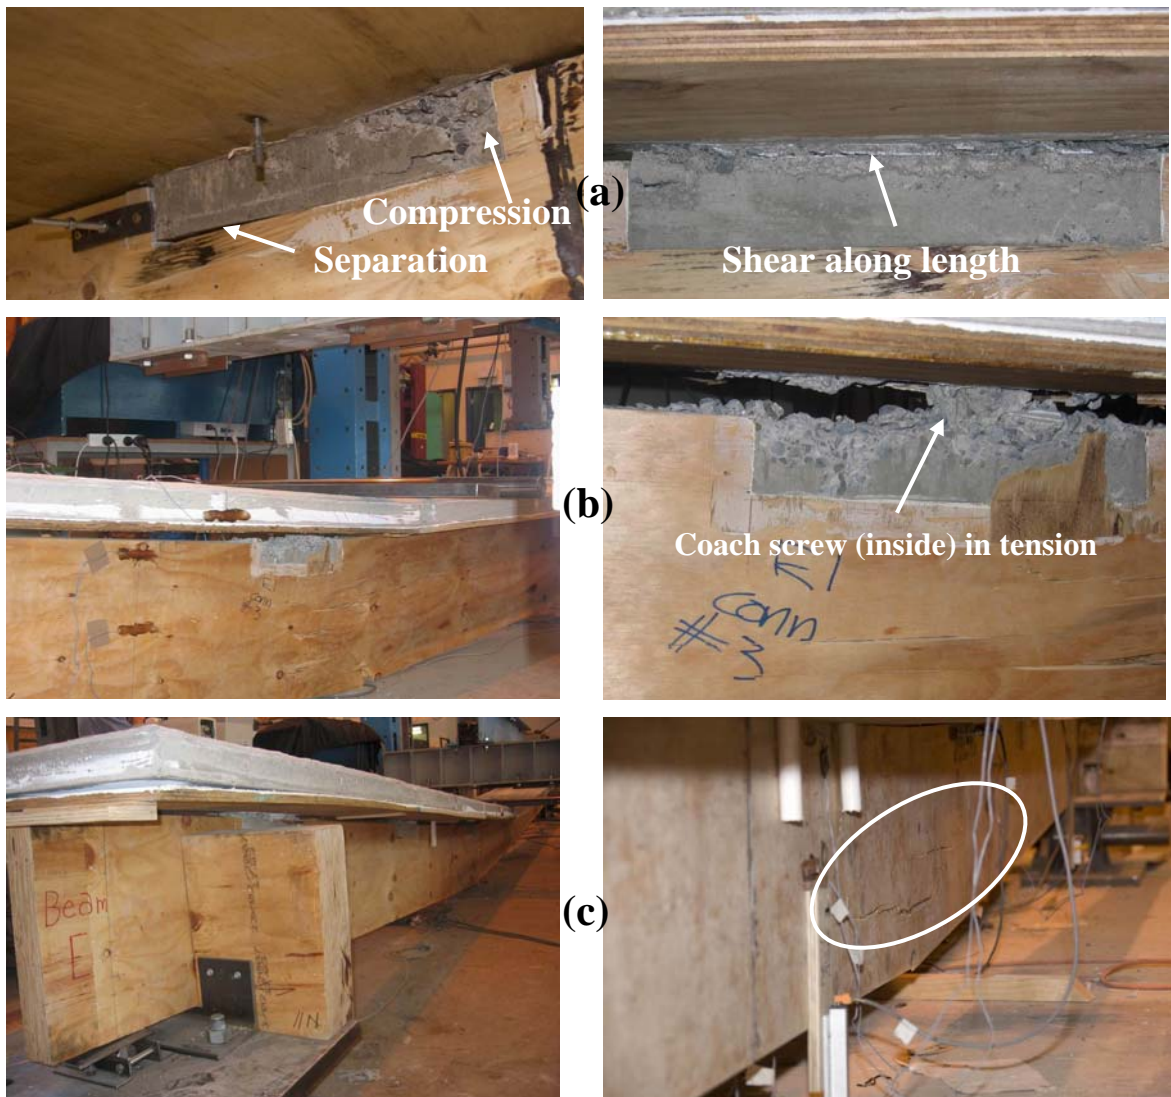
Beam E1: (a) Shear along notch length and compression failure; (b) complete connection failure with coach screw in tension at one third span; (c) LVL brittle tension at one third span
